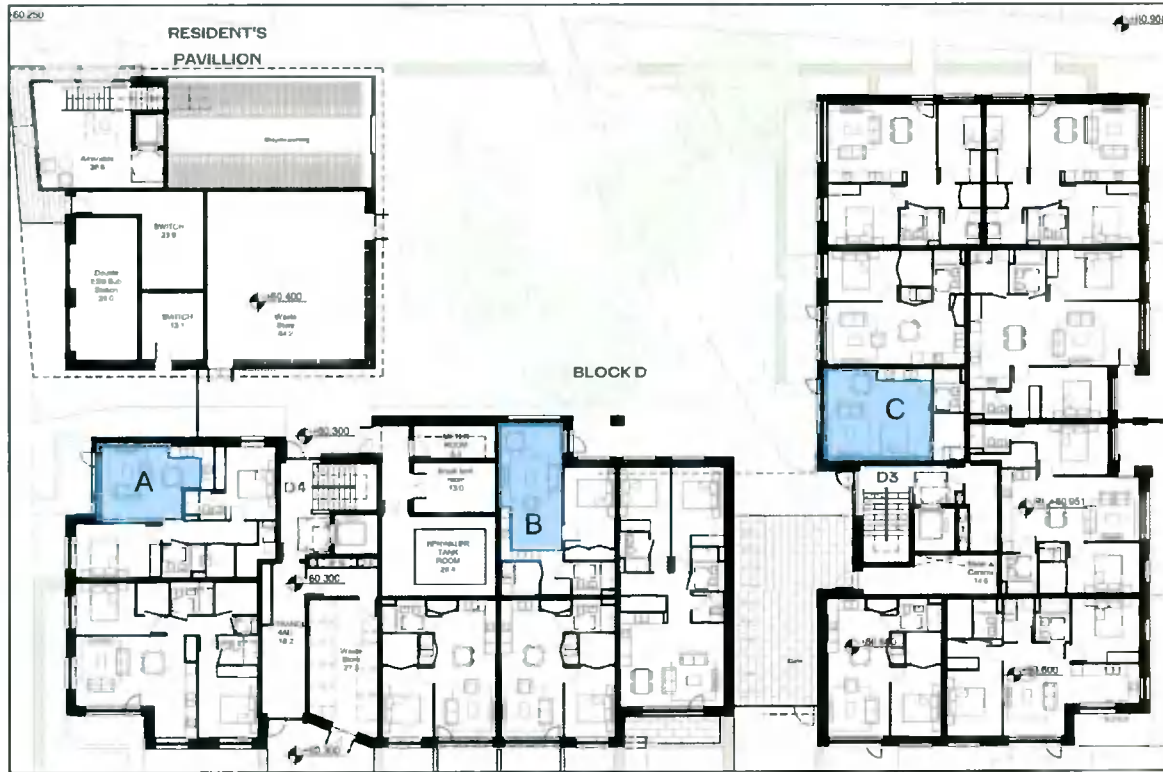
Block D – Ground Floor (South) Assessed Rooms Highlighted in Blue
